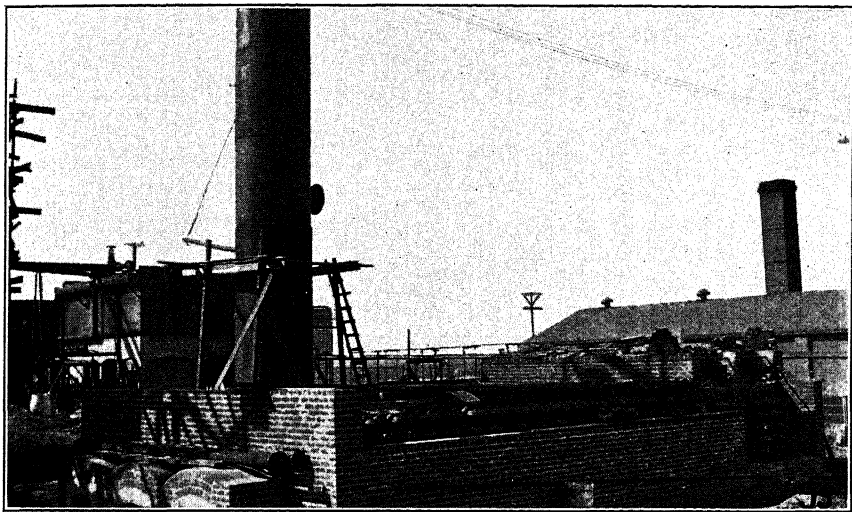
VIEW SHOWING FRONT OF FURNACES UNDER CONSTRUCTION.
